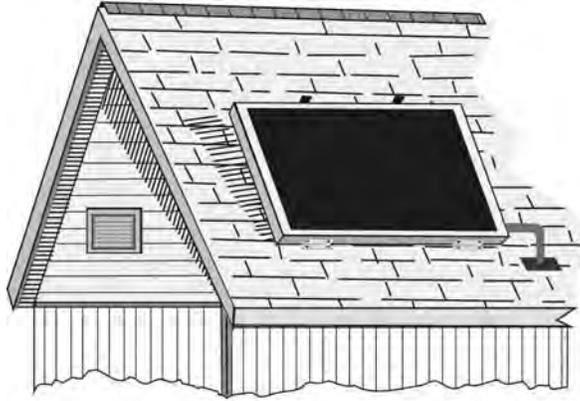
Collector mounted down from roof ridge to reduce wind loading and heat losses
